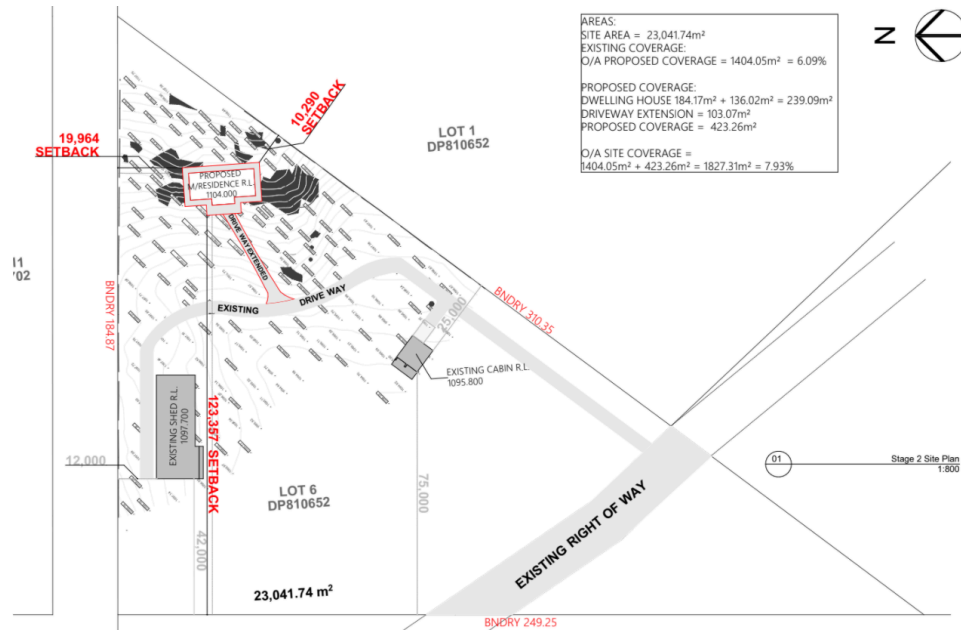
Proposed Stage 2 site plan; Source REST Joel Rosskelly Architect
